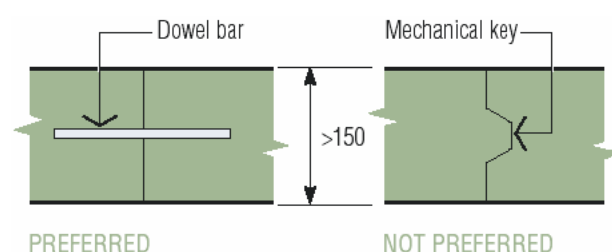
Load transfer across construction joints in slabs over 150 mm thick
